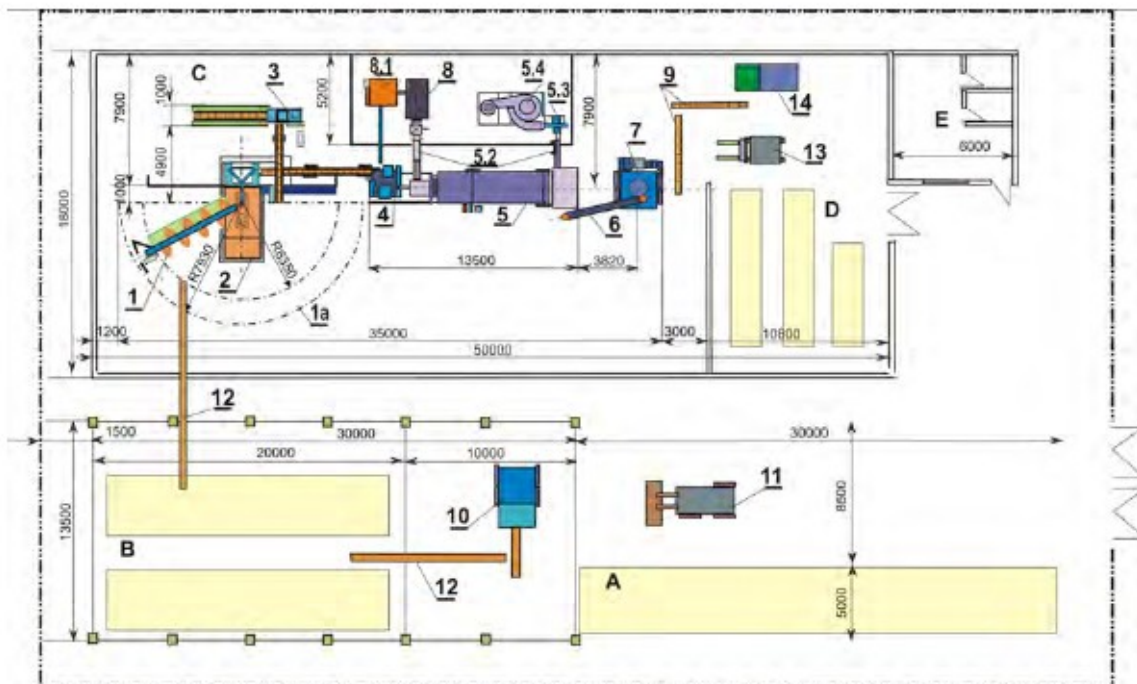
Architectural view on the Kuklish and Murtino briquetting plants
